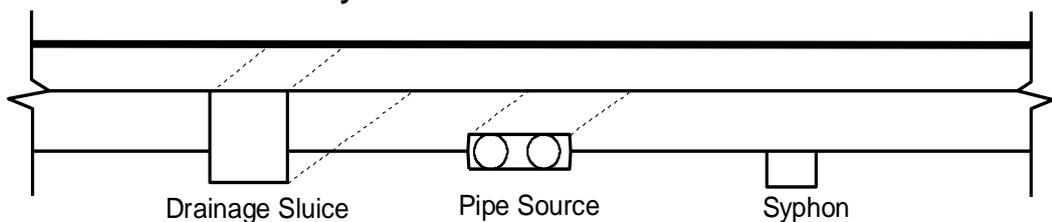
A schematic view of Drainage sluice, pipe sluice and siphon on embankment which relieve drainage congestion.
